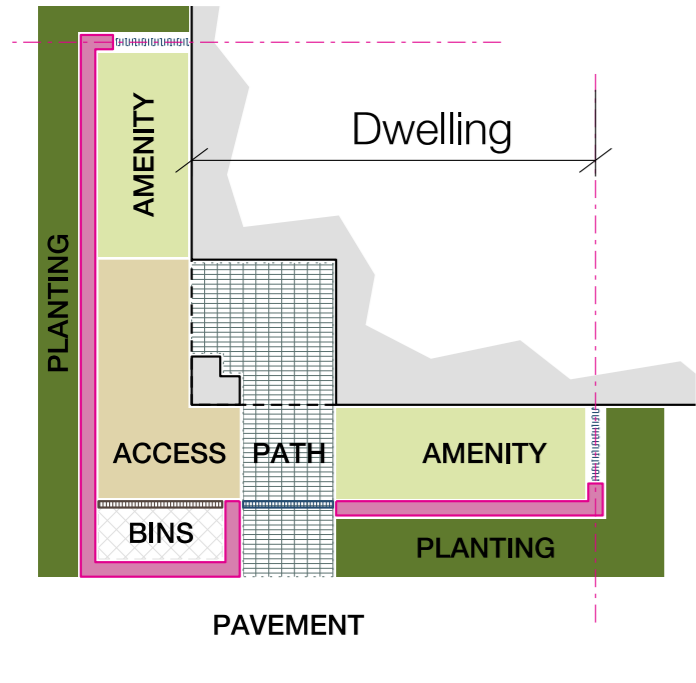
Typical ground floor maisonette / apartment boundary condition.
